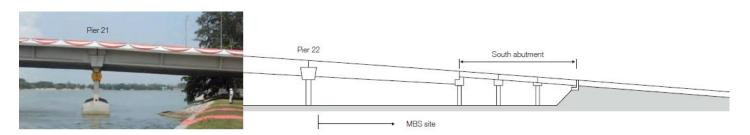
Elevation of south end of the Benjamin Sheares Bridge.
